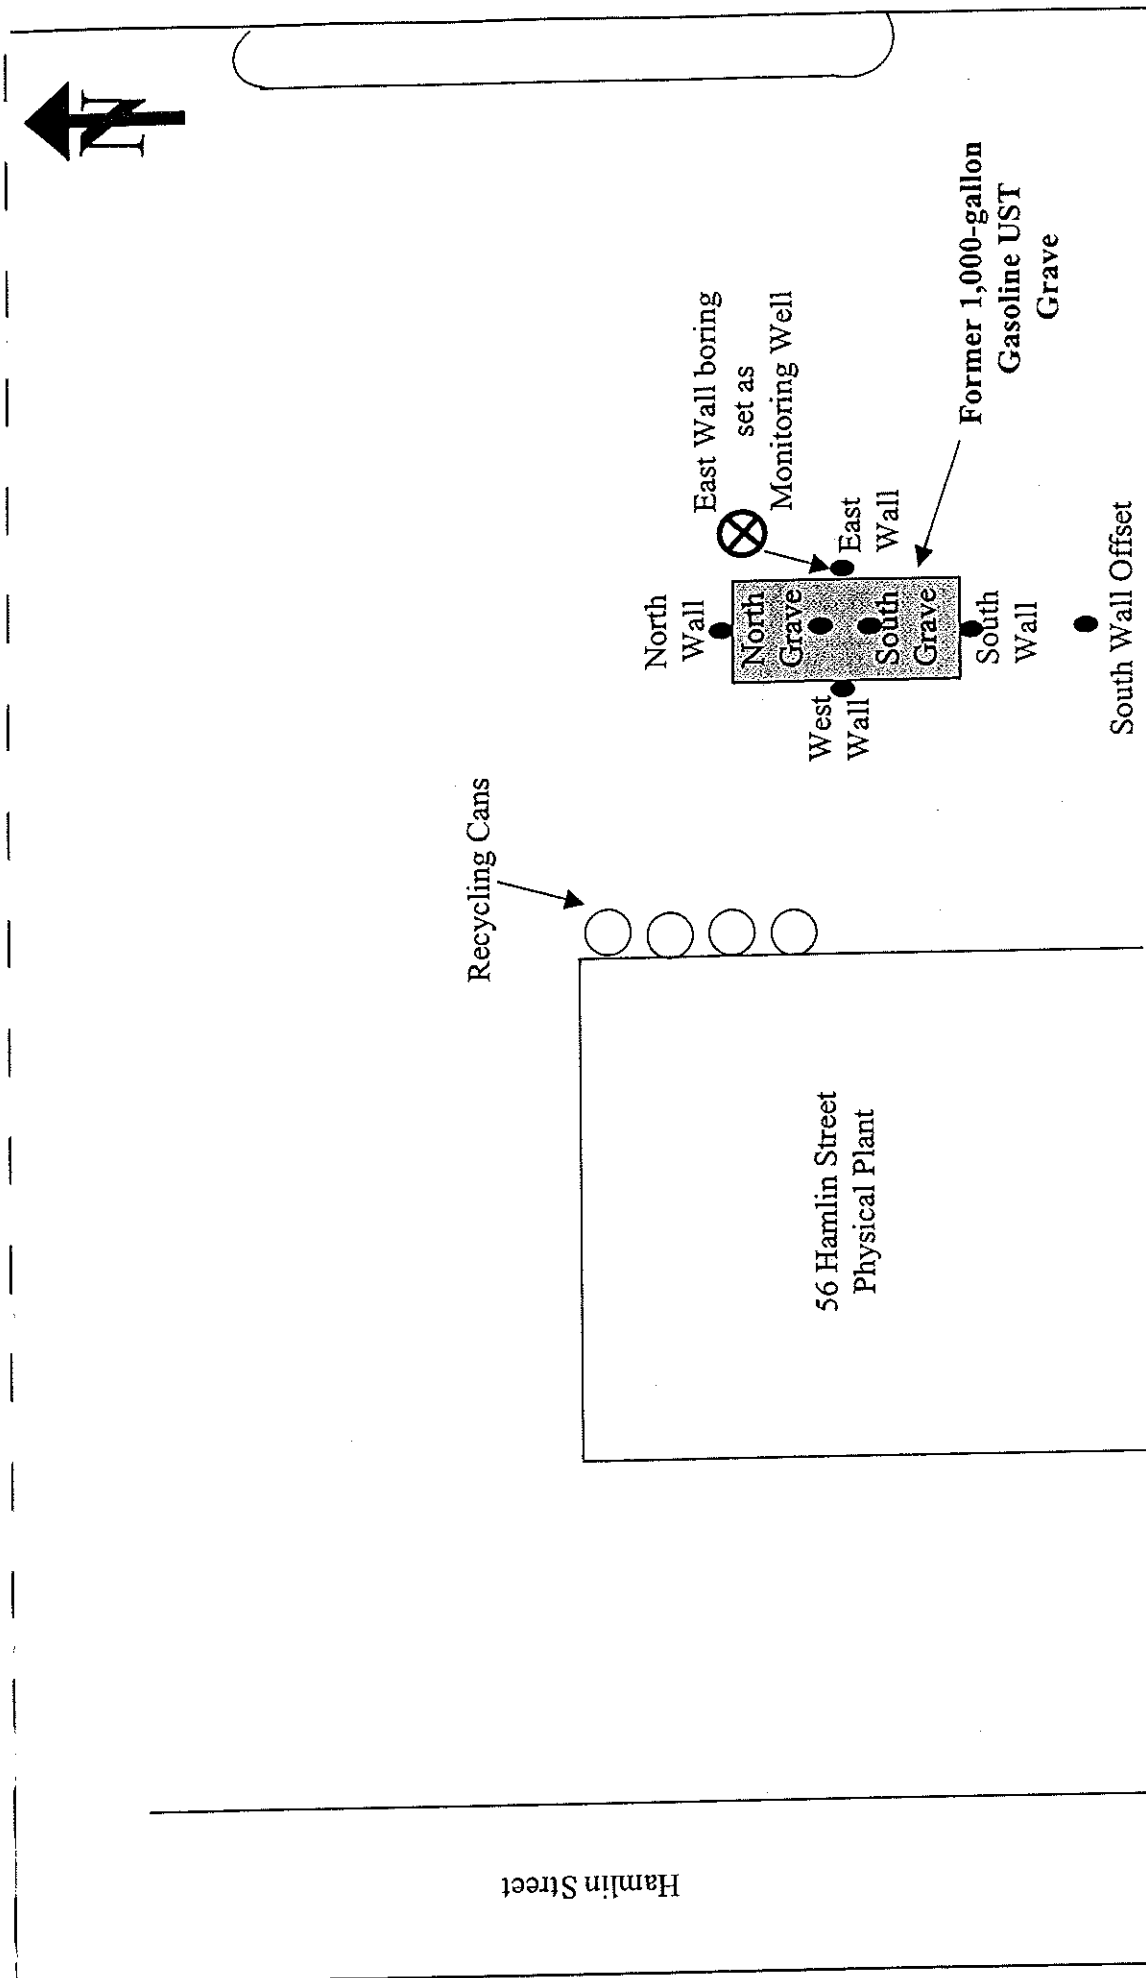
Sketch Plan of Tank Excavation and Sample Locations
